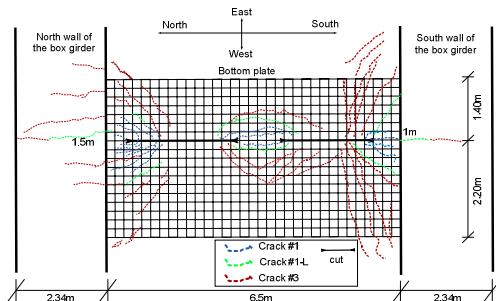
sketch of the cracks after damage scenario #1, #1-L and #3 at 0.45L [1]
